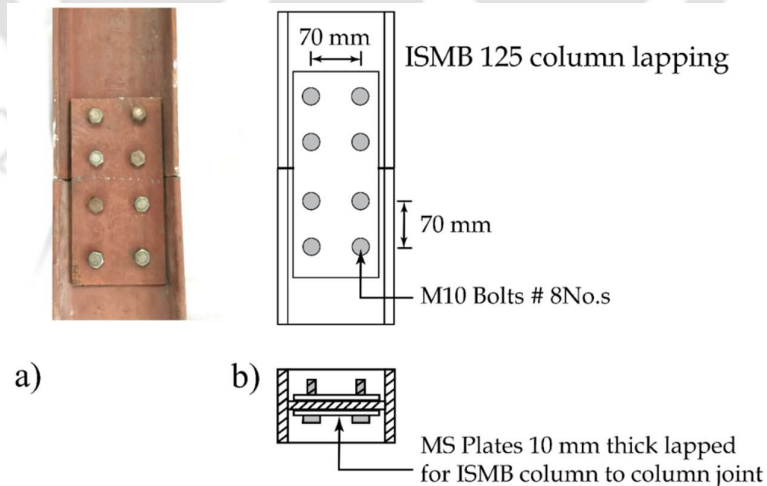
(a) Enhanced image of the column web splice connection and; (b) schematic structural detailing of the splice connecting column web
